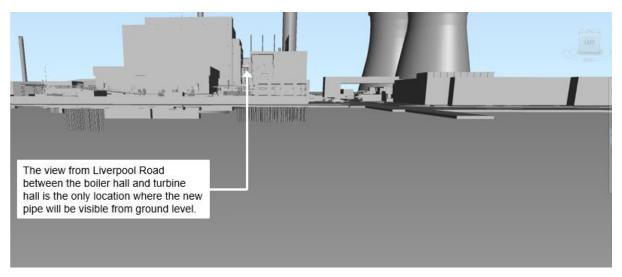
3D Model Aerial View (Bare Earth view from Liverpool Road of Consented Development with external pipework and pipe supports looking between turbine hall and boiler hall (Note – Proposed Project external pipework is coloured blue)
